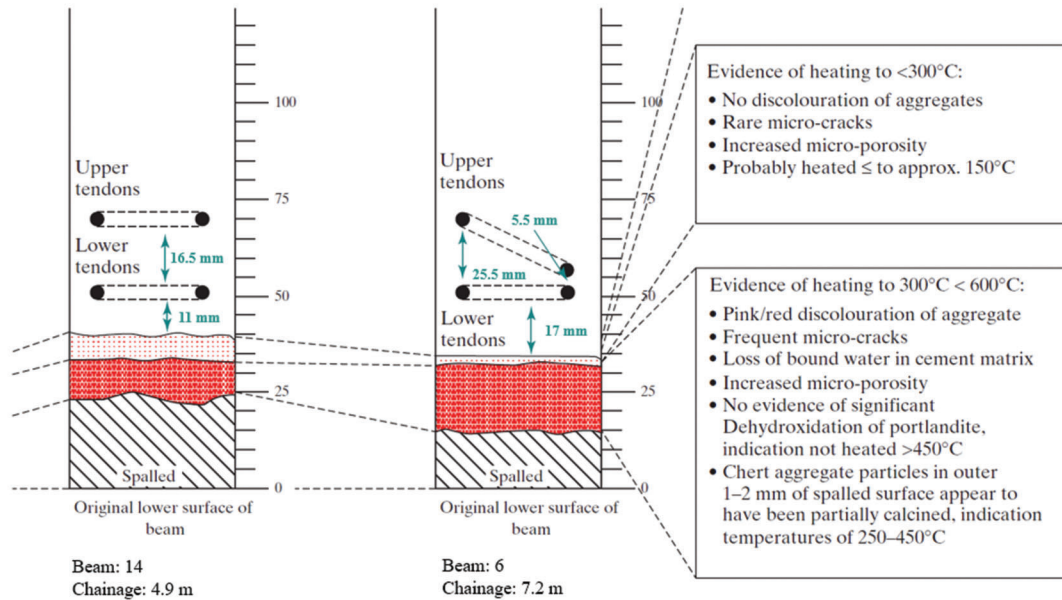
Location of concrete cores at girder bottom flange (de Melo et al., 2014).
